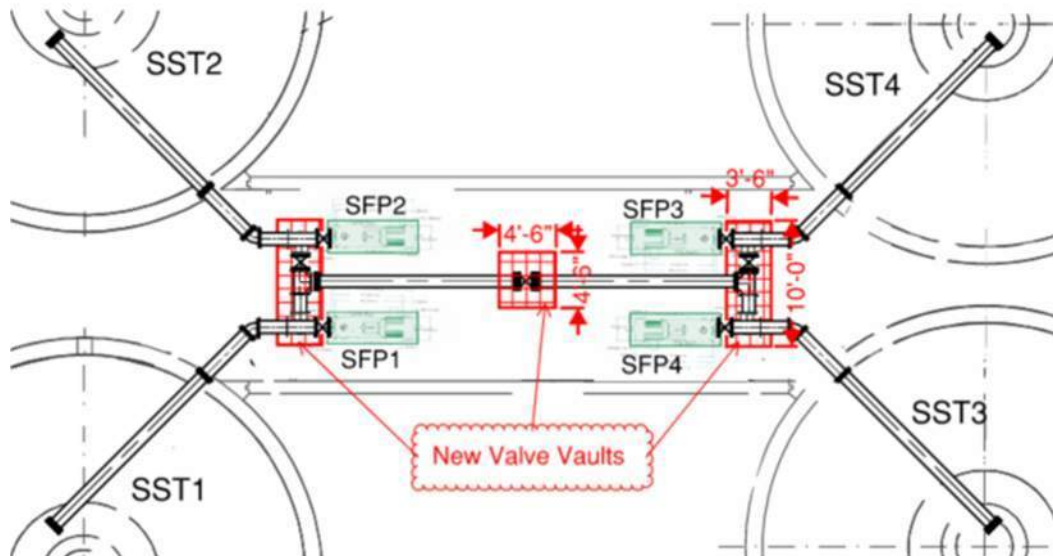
Alt-2A SSTs 1-4 Pipe Gallery Proposed Layout with Raised SSTs – Plan View
